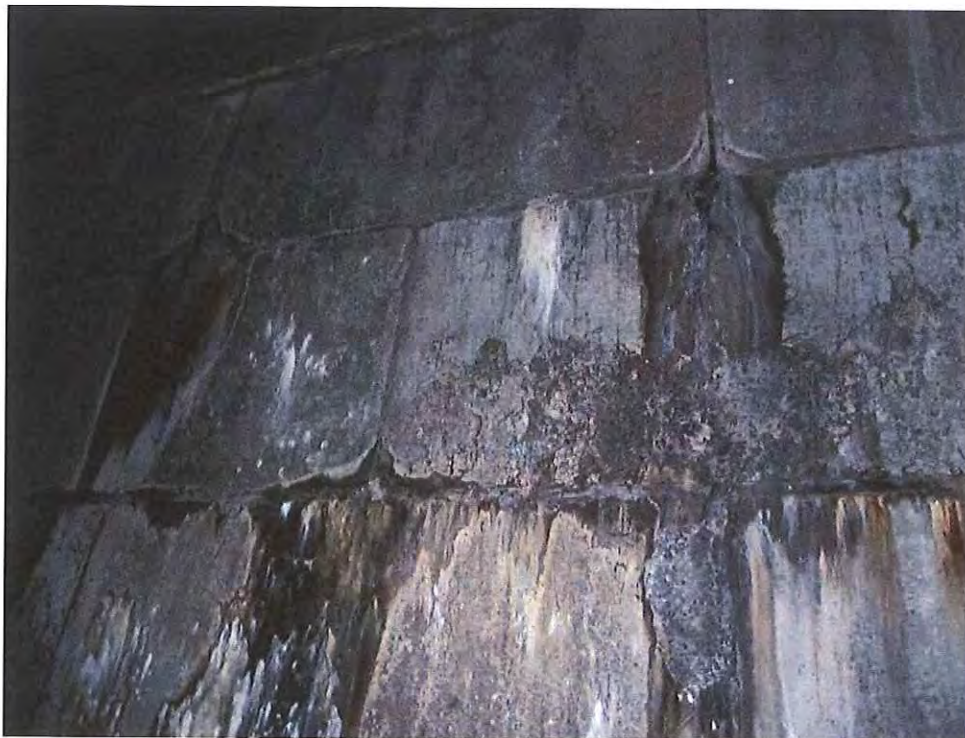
DEFECT: - Wingwall – Vegetation on cope
